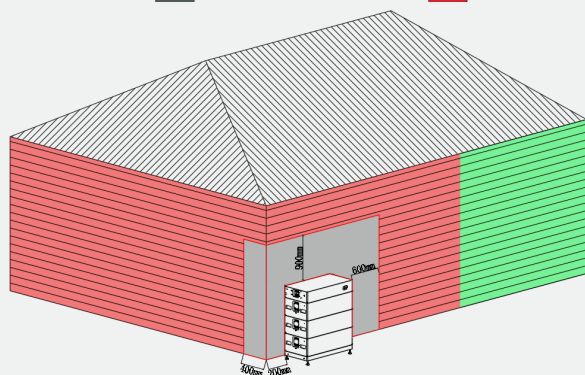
elevation 2 – 200mm from the corner of a non-habitable room
